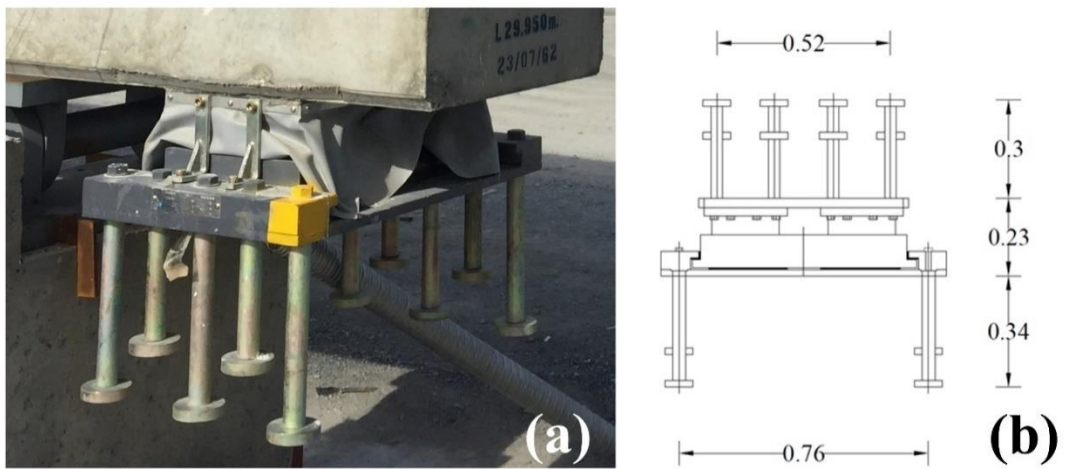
Typical details of end bearing (a) Typical view of end bearing, and (b) Typical details of end bearing.
